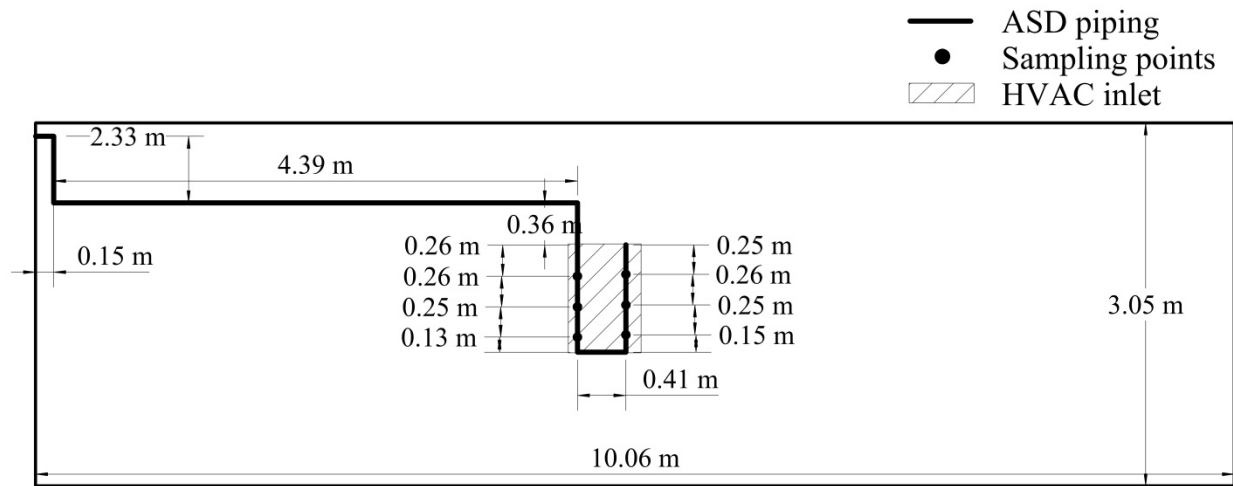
ASD5 piping layout, with sampling locations located at the HVAC exhaust
